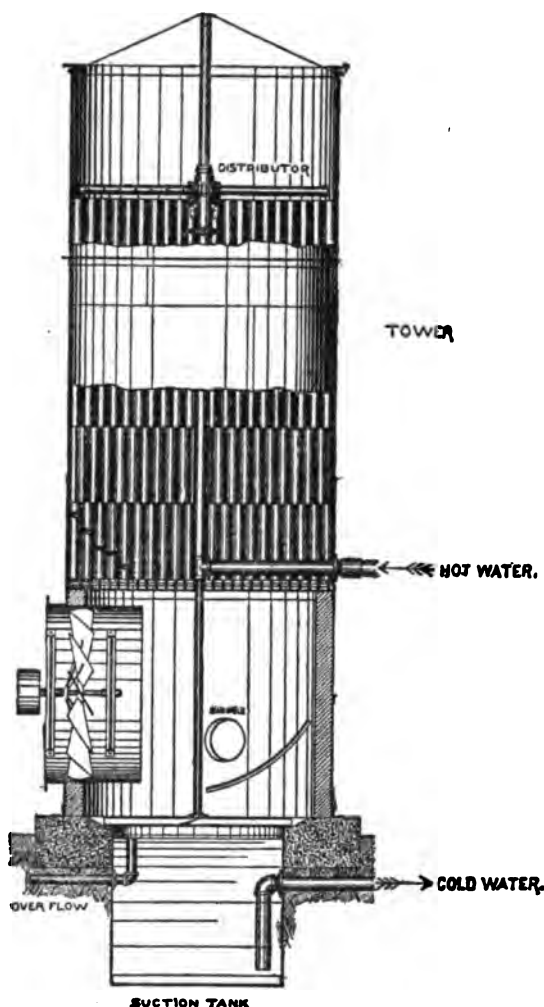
Section of Worthington Cooling Tower. The Earthenware Pipes used for breaking up the Water are shown, also the Fan and other Arrangements.
